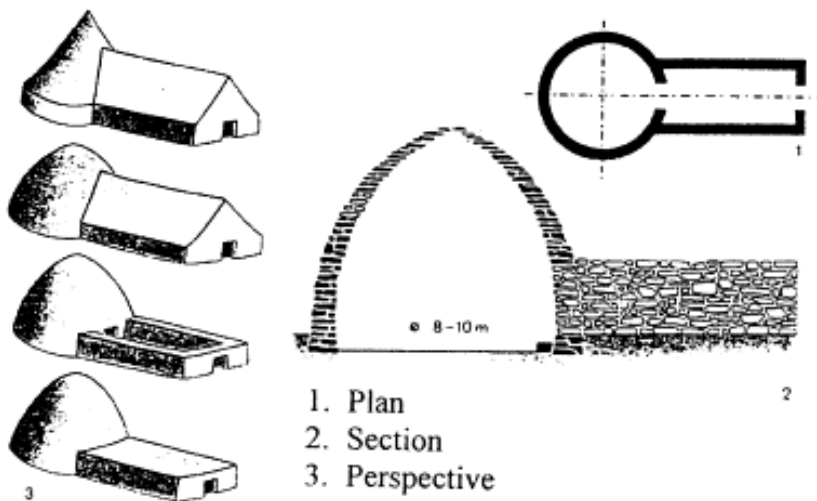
Domed building forms found in Mesopotamia excavations belonging to 7th century BC (Özdeniz et al., 1998)
